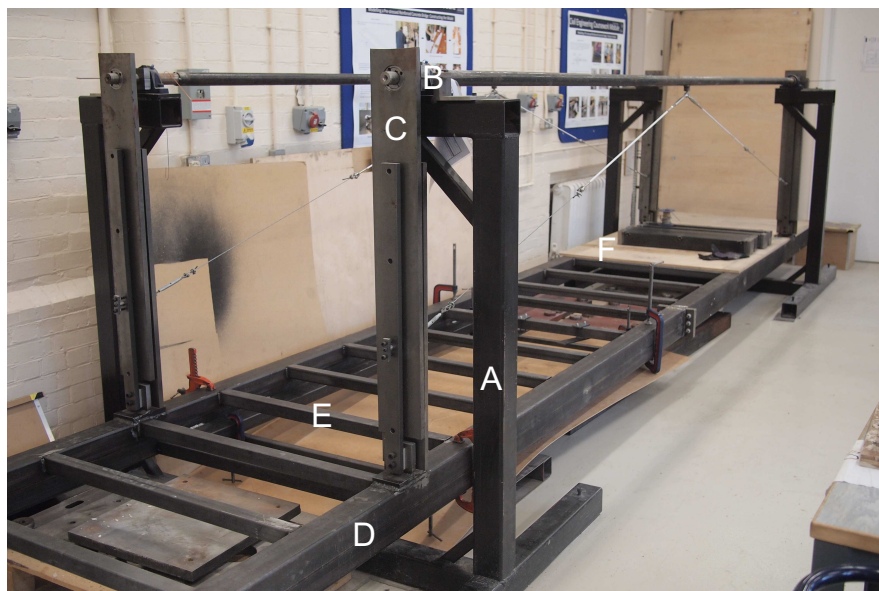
Configuration of the bridge before modification. (A) Structural support frame (B) Rotating bearing housing and circular handrail (C) Bearing pin assembly (D) Rectangular girders (E) Joists and (F) Plywood decking.
